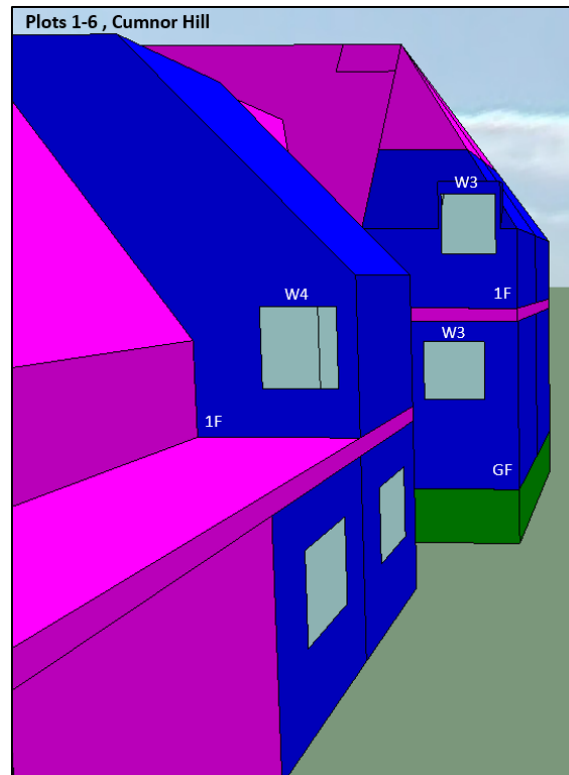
Plots 1-6, Cumnor Hill (North West Elevation) Windows Tested
